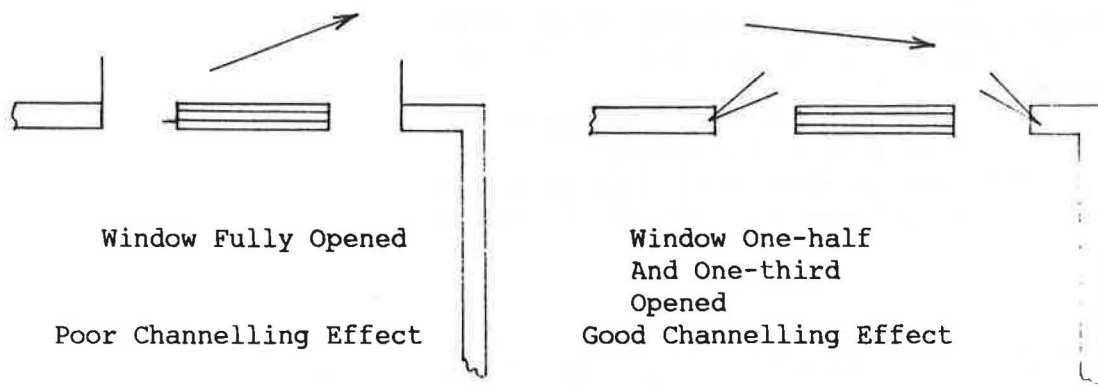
Window opening positions and wind path i.e. directions for north facing windows
